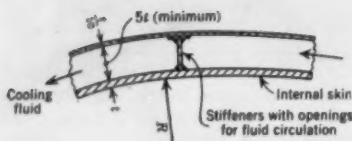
A double-wall shell, shown in cross section, will provide the recommended lunar base structure with protection against meteoroids. The opening between the two walls will be used for the circulation of a cooling fluid.
